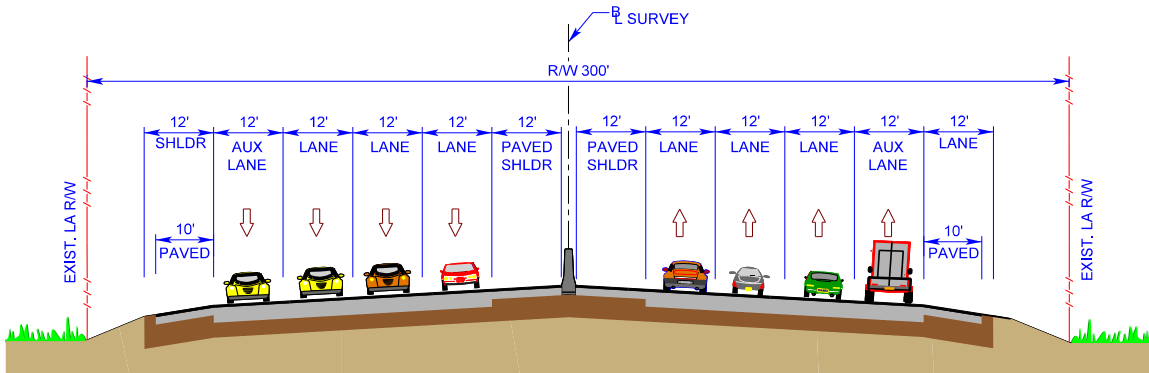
Existing Typical Section- Florida's Turnpike Mainline
